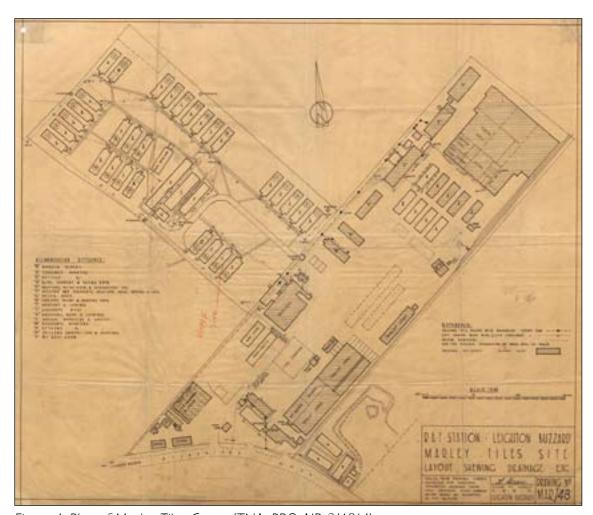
Plan of Marley Tiles Camp (TNA: PRO AIR 2/4814).
